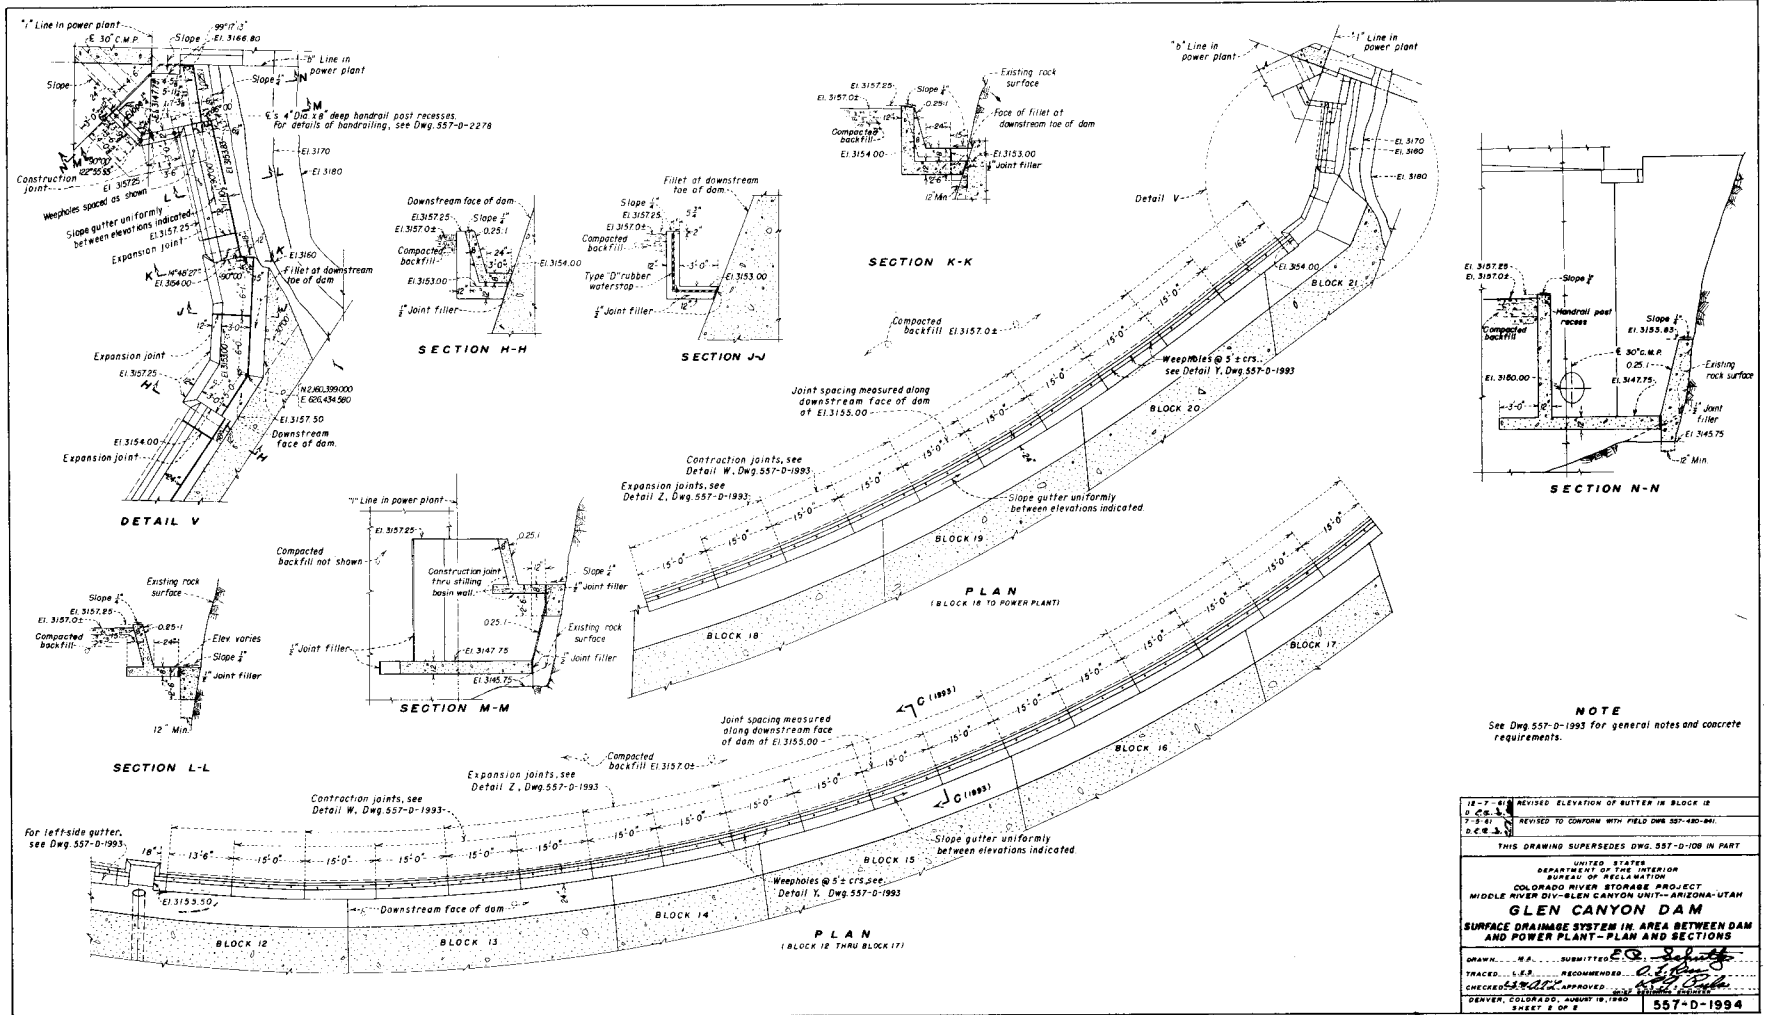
Surface drainage system in area between dam and powerplant—Plan and sections. (Sheet 2 of 2.)
